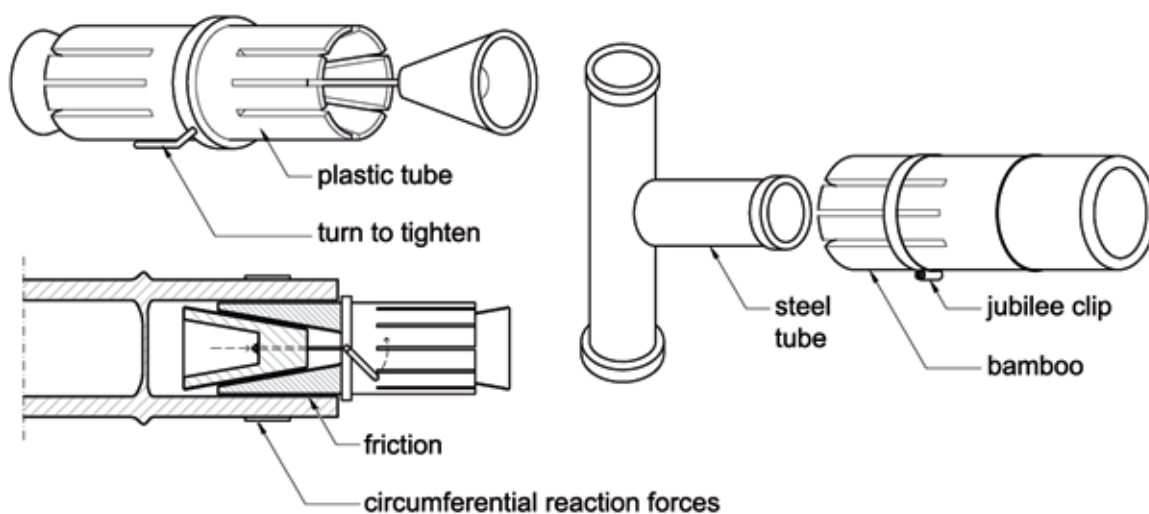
Expandable joint (left) and steel tube joint (right) proposed by Nienhuys (after Nienhuys, 1976)
